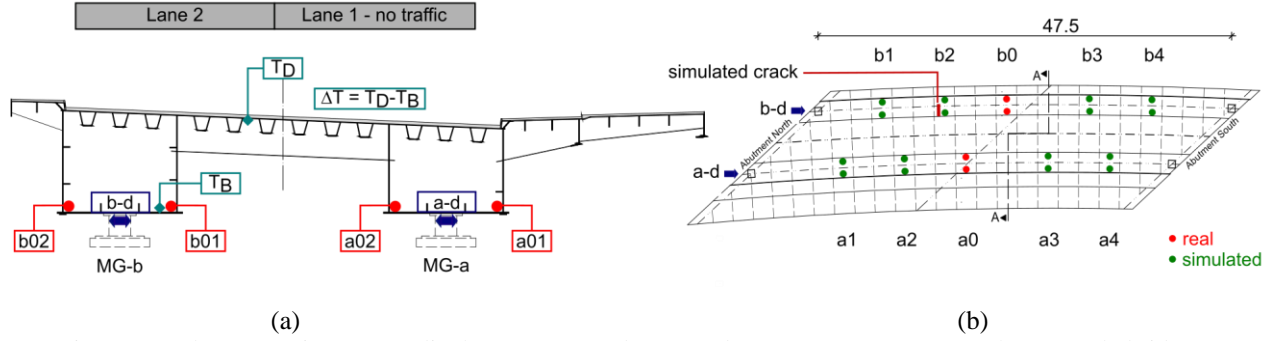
Relevant strain gauges, displacement transducers and temperature sensors on the example bridge: (a) cross section (b) plan view.
